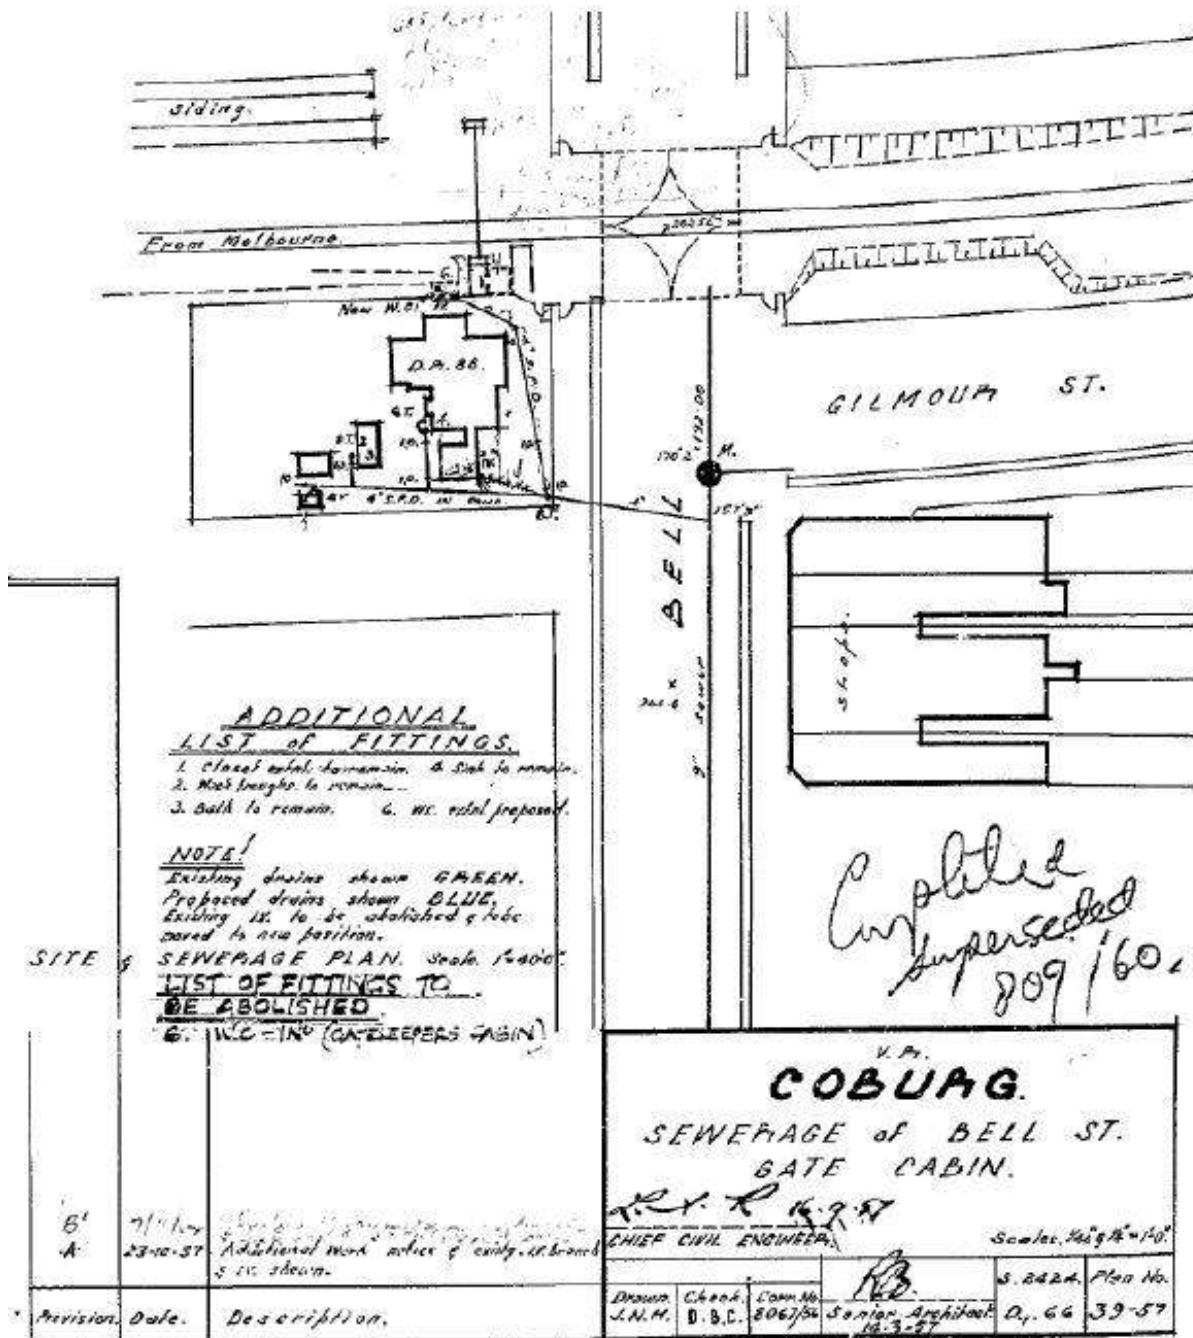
1957 Detail plan of proposed sewerage systems for the Bell Street Gate Cabin showing the layout of the cabin and associated out-houses. (Public transport Victoria Drawing Management System. 10/06/2020).
